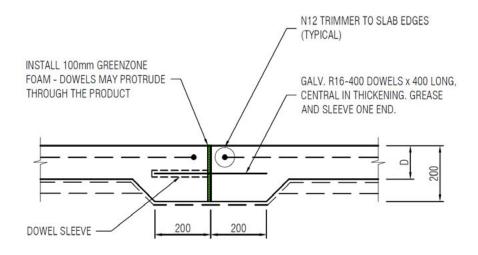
A Dowelled Expansion Joint (DEJ) typical detail
